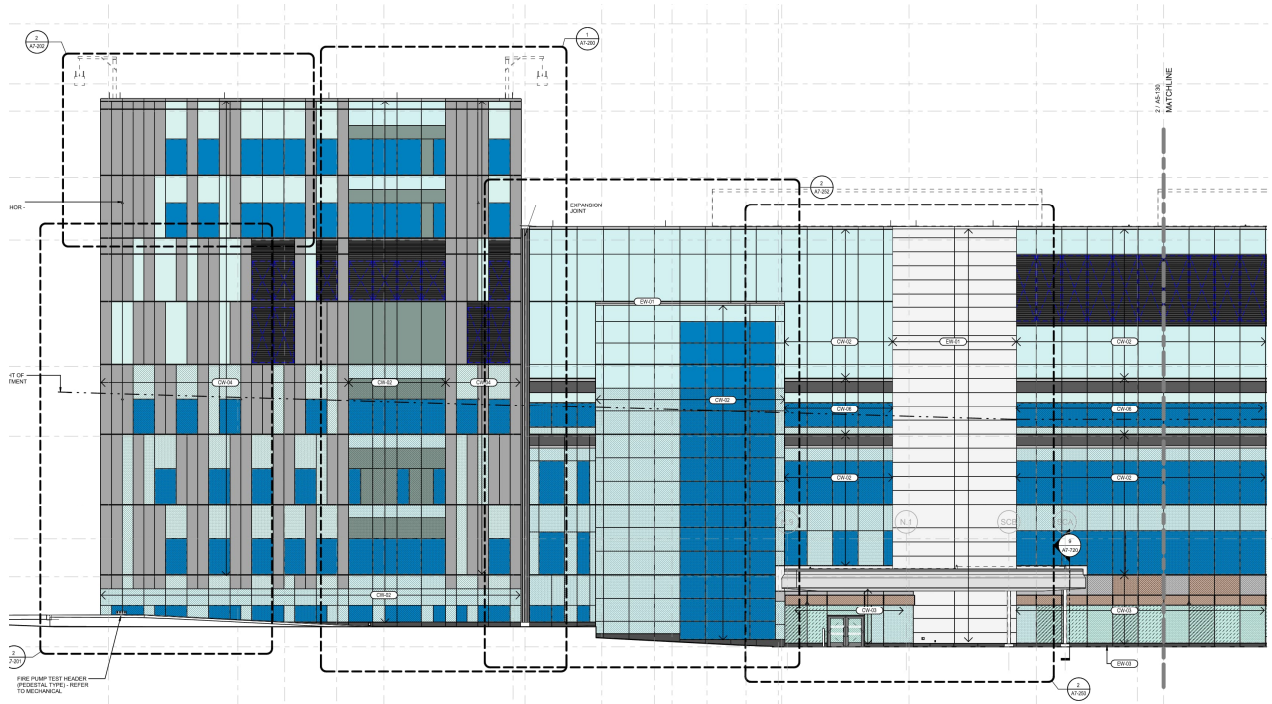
Partial south elevation showing the proposed louvers positioned at the fifth floor (see Plate 6 for reference)
